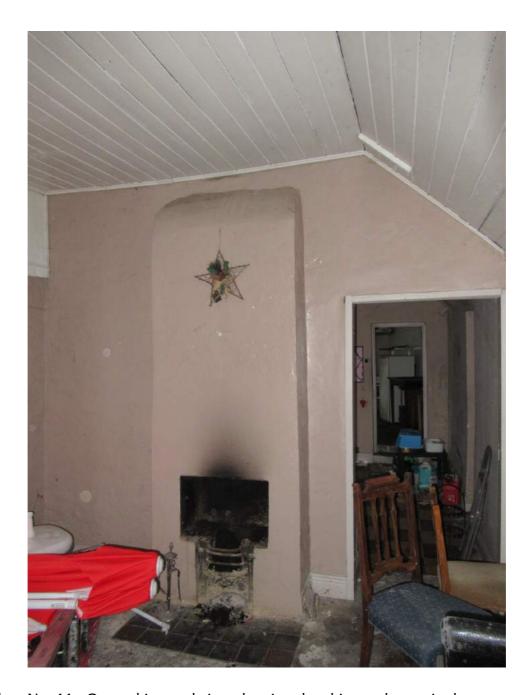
General internal view showing the chimney breast in the east room in the cottage. Note the timber-sheeted ceiling, with the collar ties raised above the wall heads.
